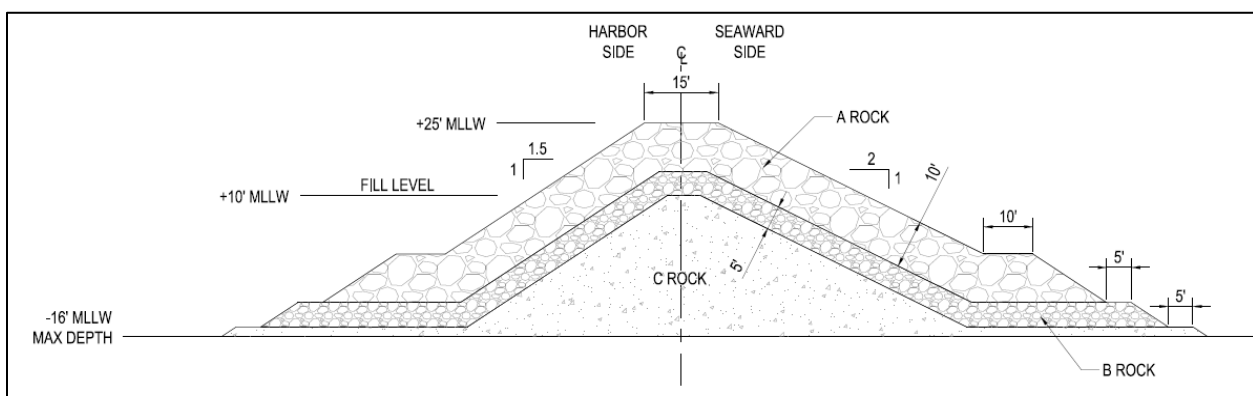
Typical Breakwater Cross Section for Alternatives N-3, N-2, N-1, and N-4
